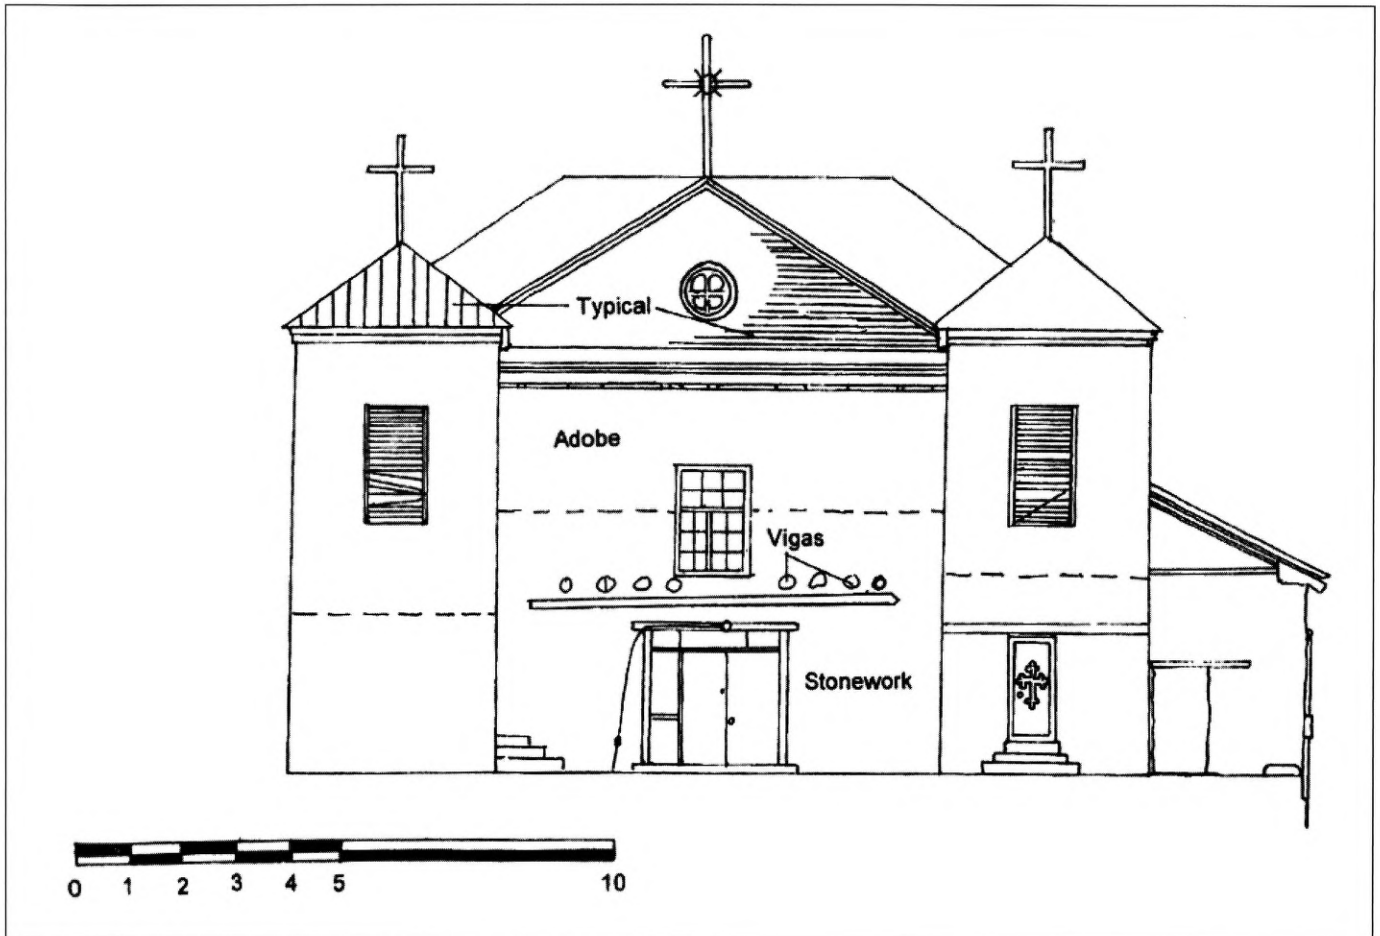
Front elevation of the church of San Miguel de Vado (Oberndorf)
